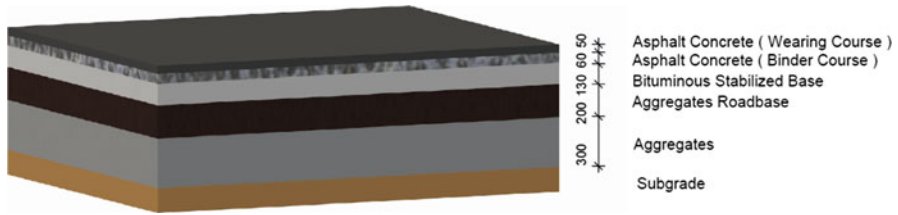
Asphalt concrete pavement – bituminous stabilized base
